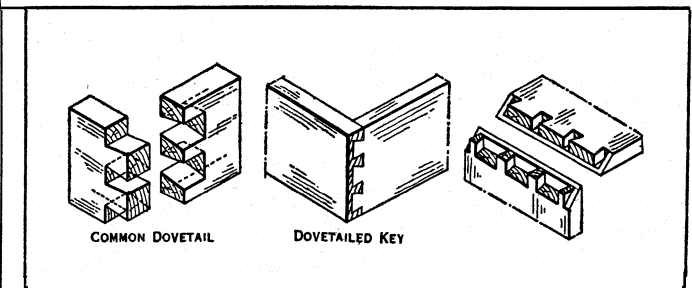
JOINERY JOINTS—DOVETAILS; (A) COMMON DOVETAIL. (B) LAPPED DOVETAIL. (C) MITRE OR SECRET DOVETAIL
